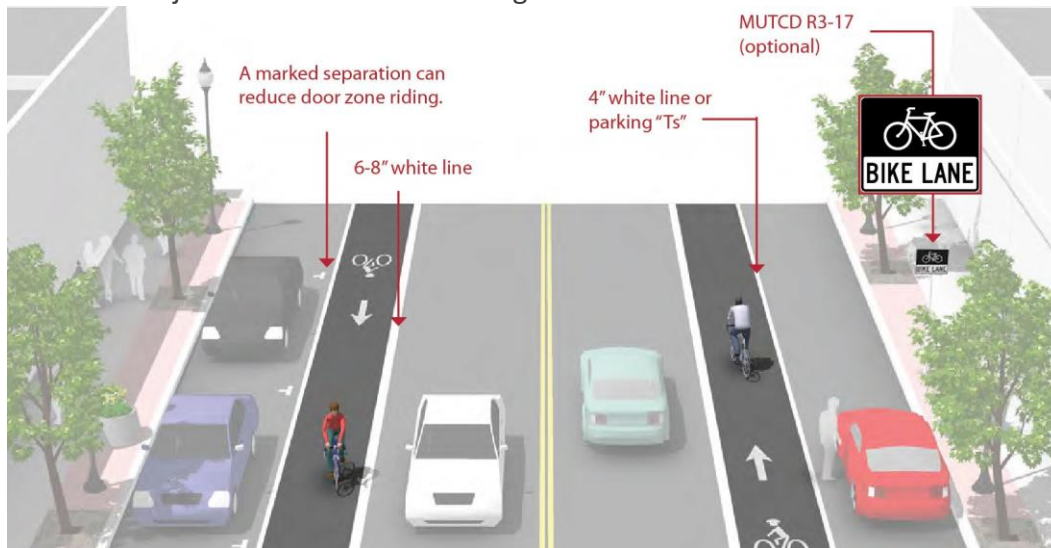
Bike Lane Adjacent To On-Street Parking
